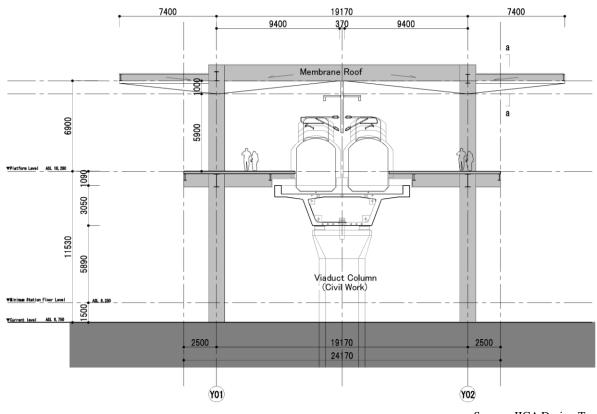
Station Cross Section (Outboard- Type Platform)
